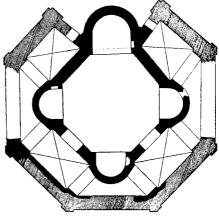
Plan, Orthodox Baptistery, Ravenna
